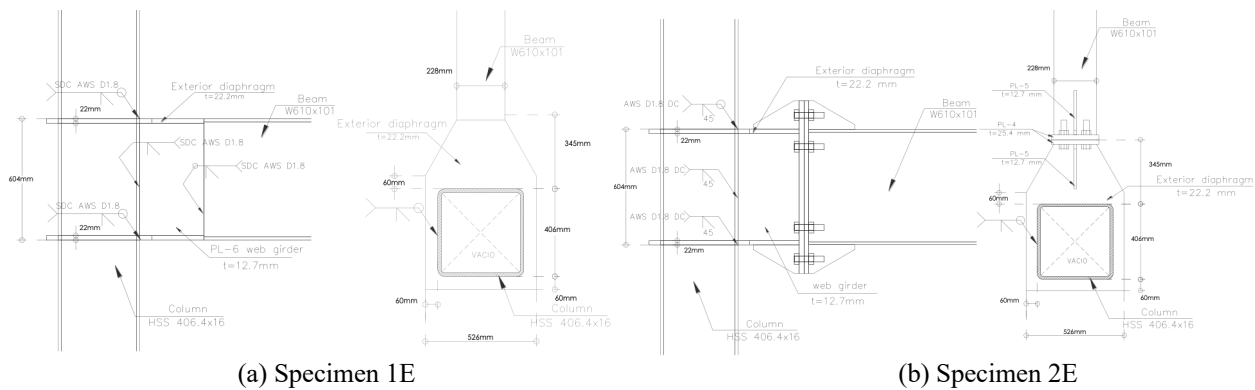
Specimens 1E and 2E with exterior diaphragm connections
